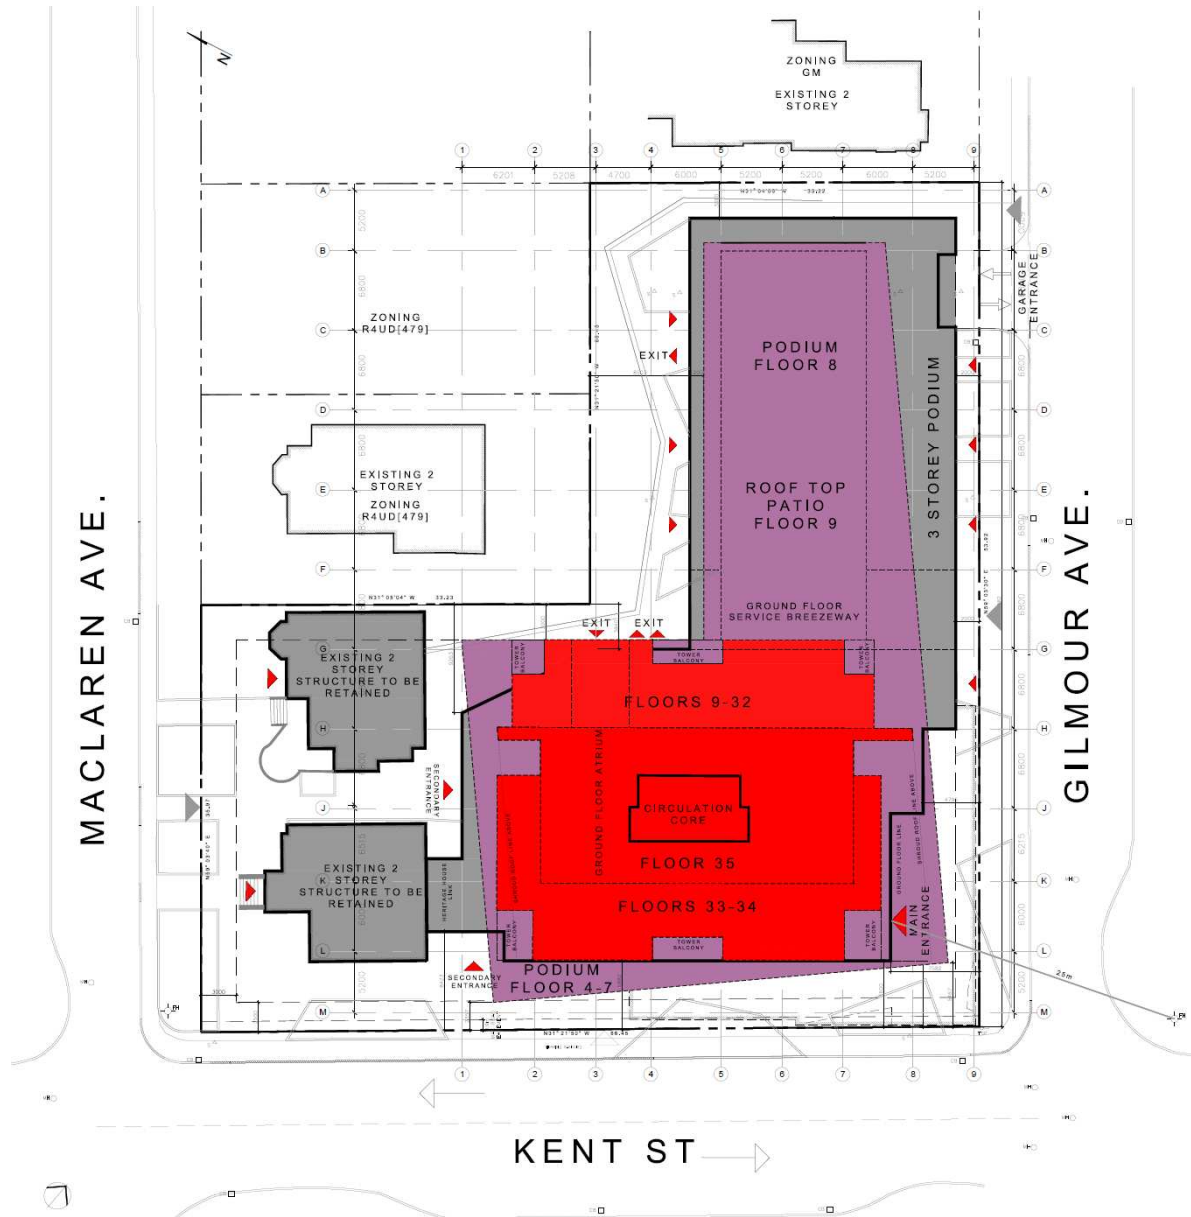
Site plan illustrating the relationship of the proposed development to the street, the two heritage buildings at 444 and 436 MacLaren Street and the 2-storey residence on Gilmour Street. Source: Hobin Architecture September 2021.
